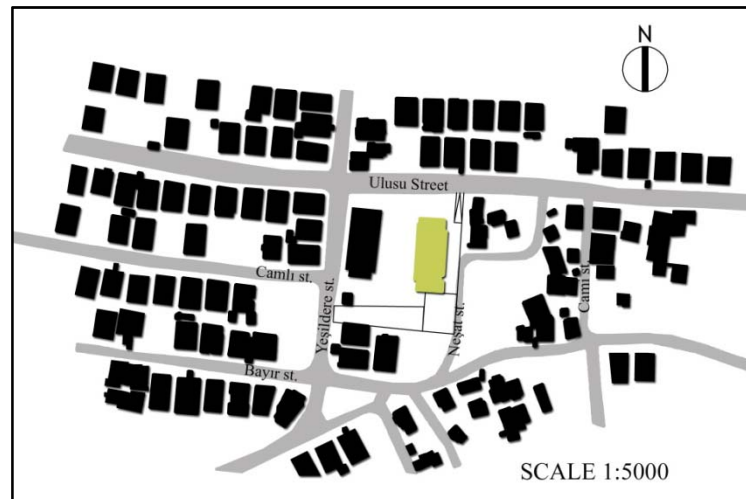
10 025 R-480 Type ŞÖMF elementary school site plan
